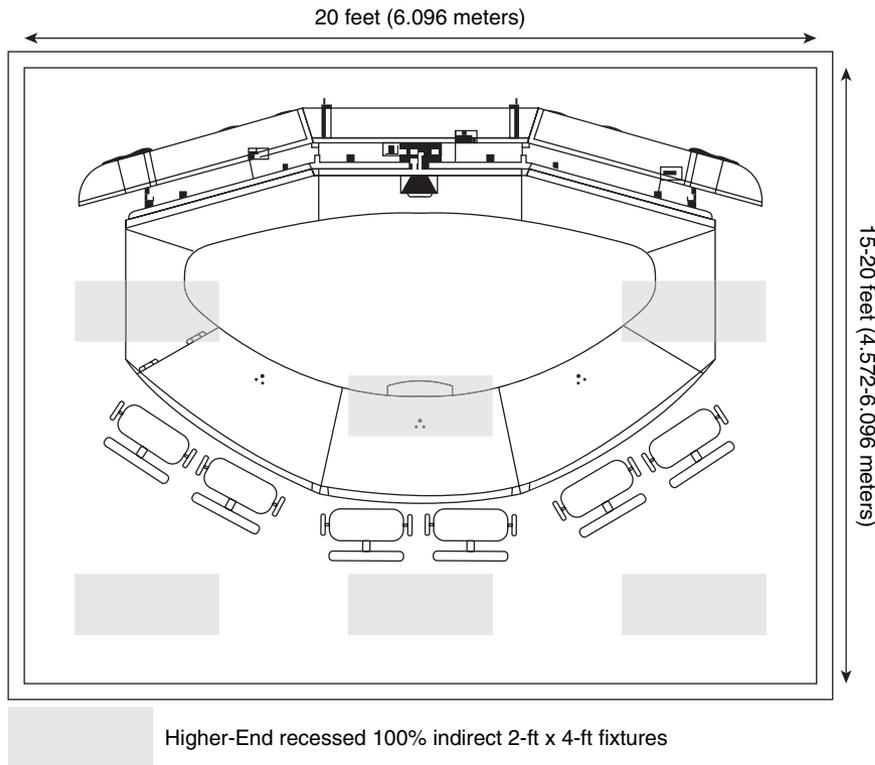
Example CTS-3000 using higher-end recessed light fixtures
